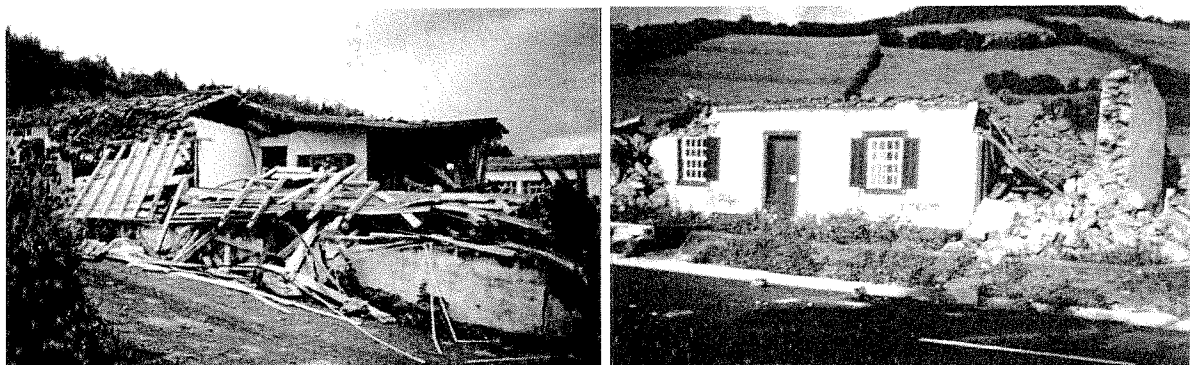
Examples of the URM buildings damage, Azores 1998 [19]
